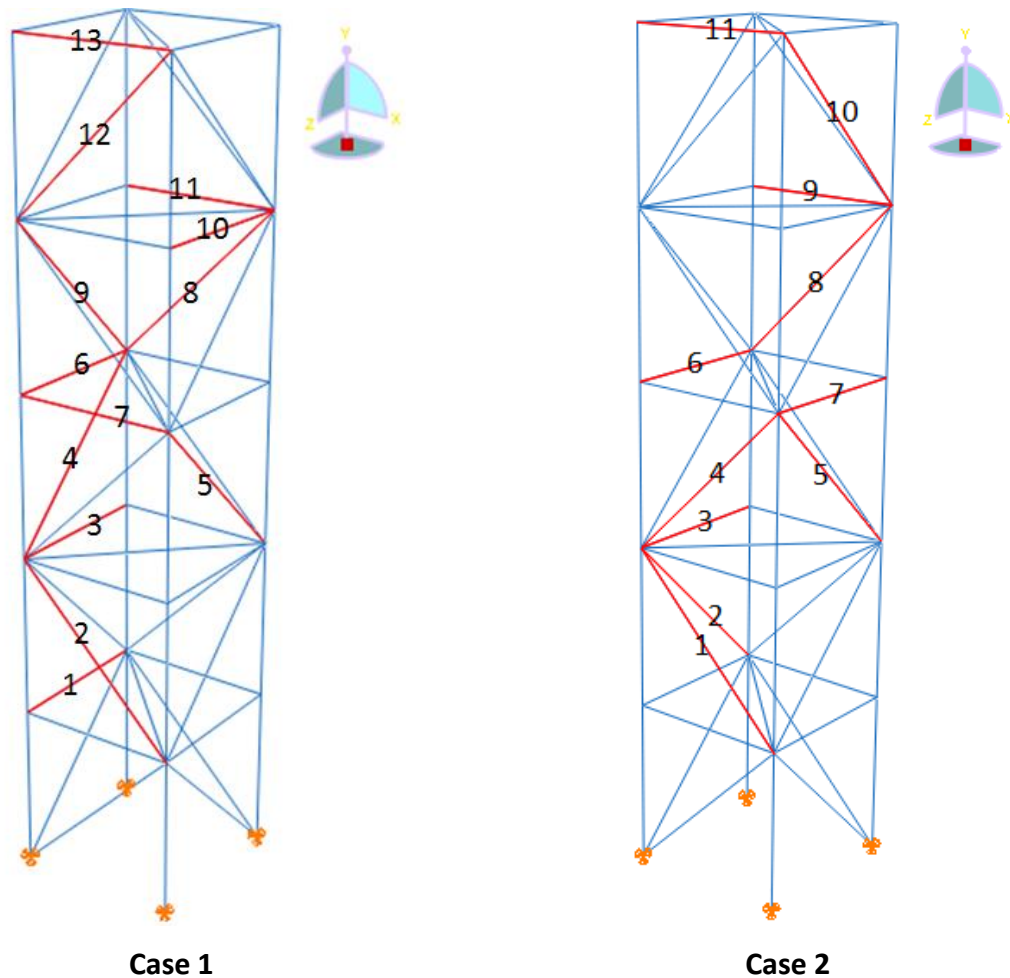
Locations of damaged members in the laboratory models with non-continuous longitudinal members
